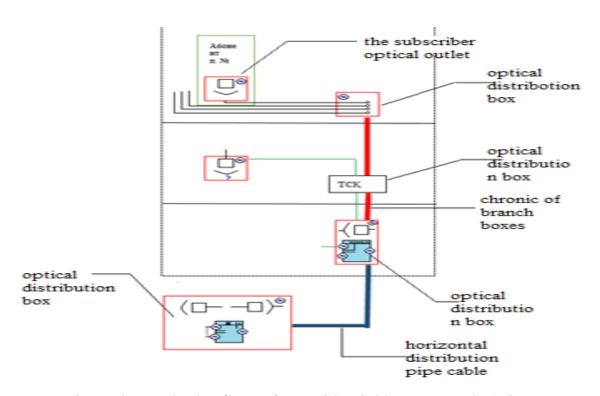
The 2st floor of a Residential house sample 1 ODB
